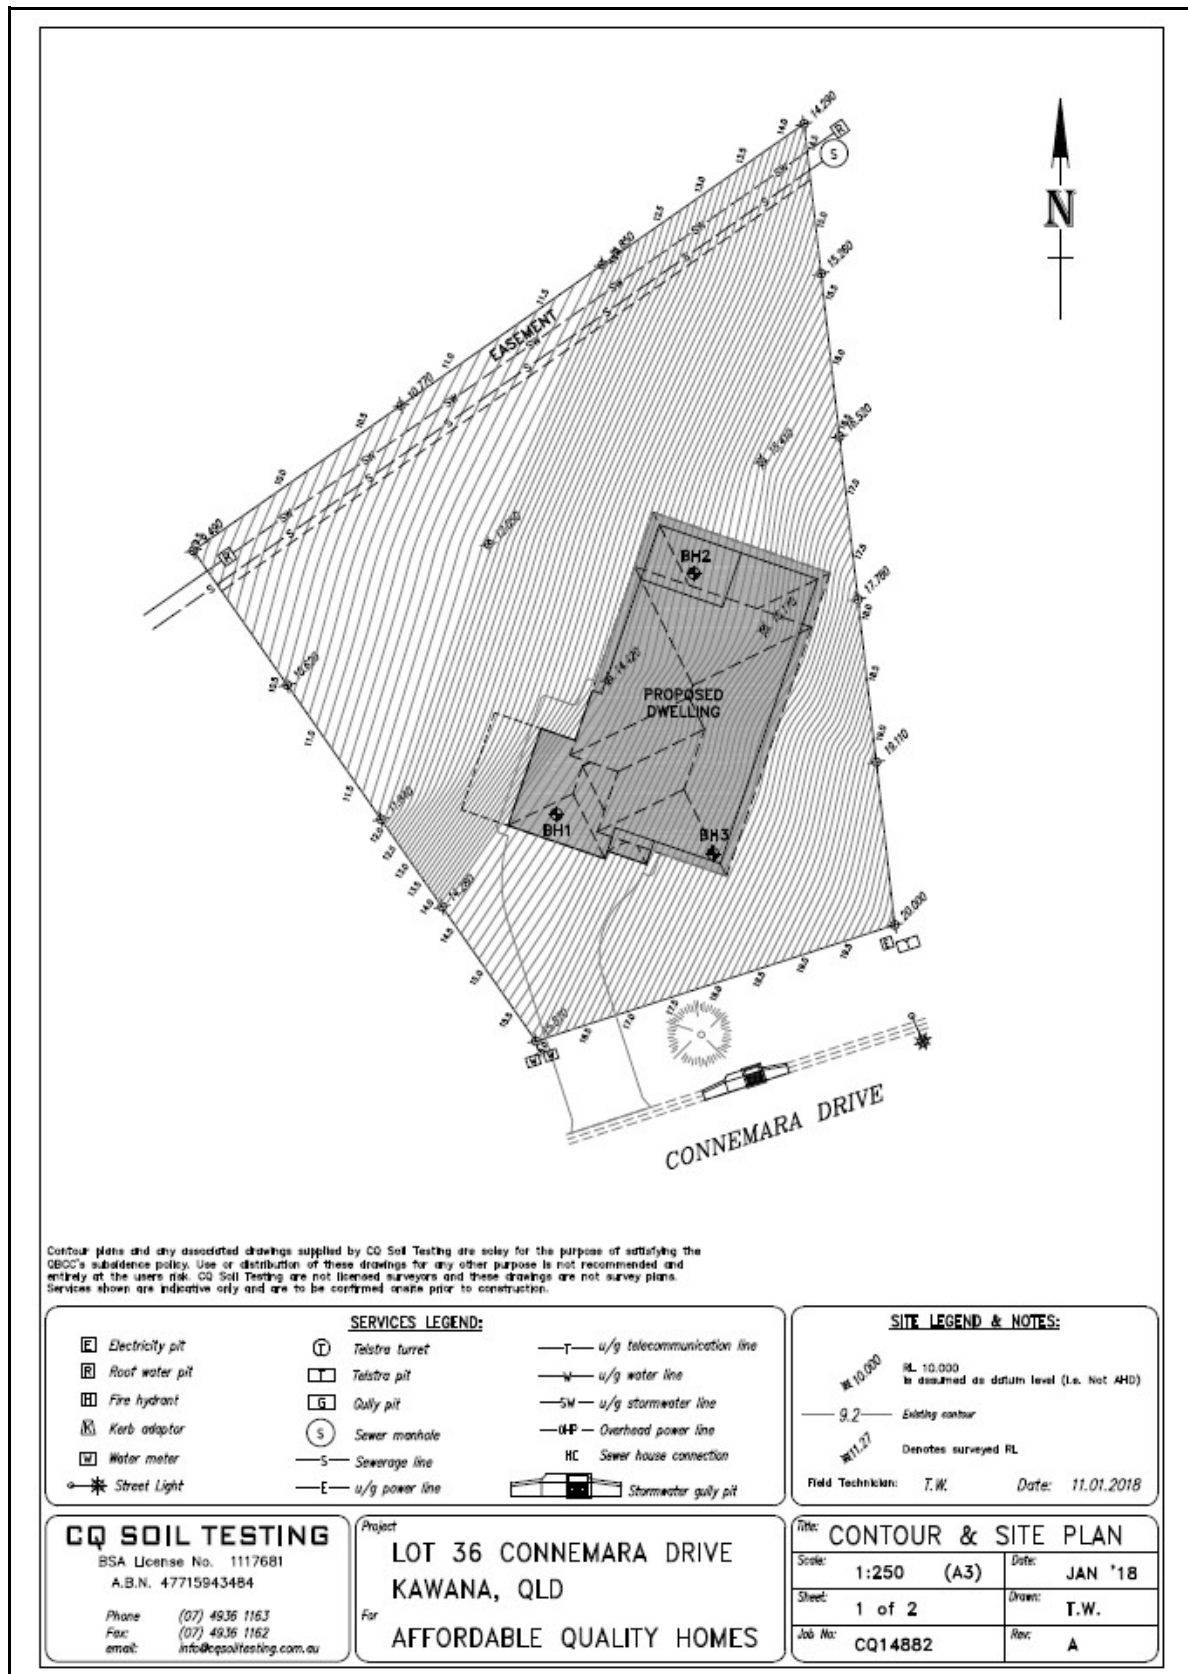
Bore Hole Locations per CQ Soil Testing, Job No. CQ14882.
